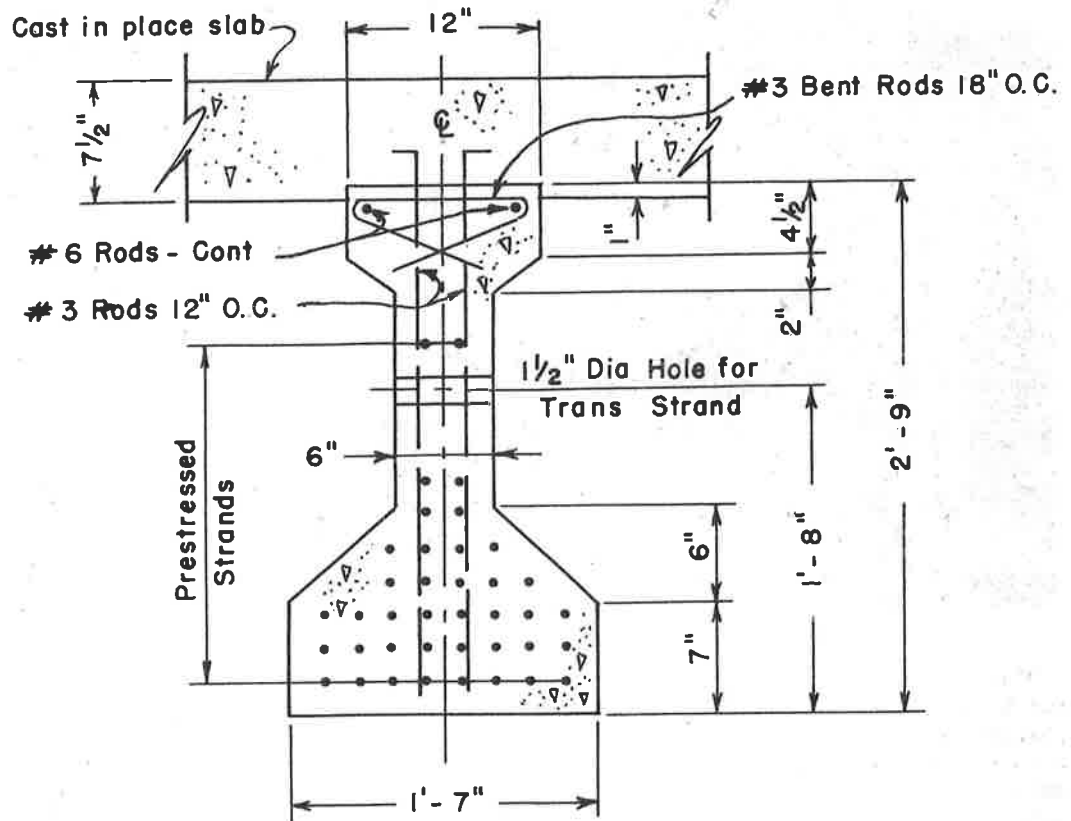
Garden State Parkway, N.J., Section II, Contract 28-31, prestressed girder detail (interior).
